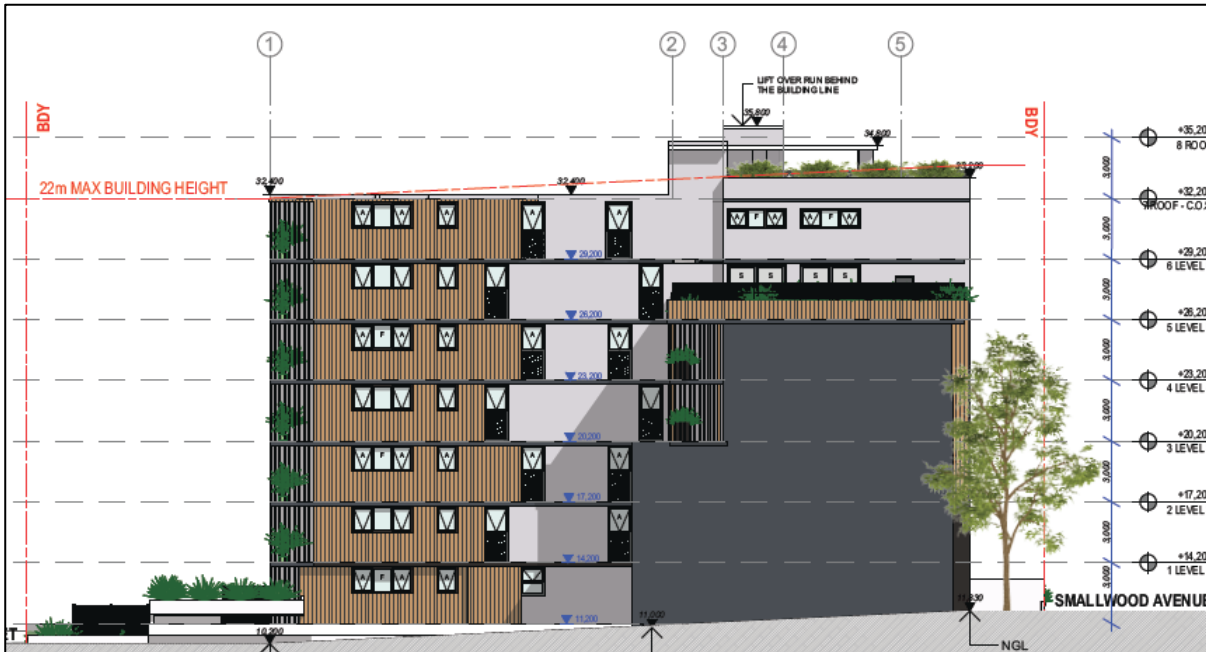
View of the southern elevation noting the extent of the proposed building height variation.
